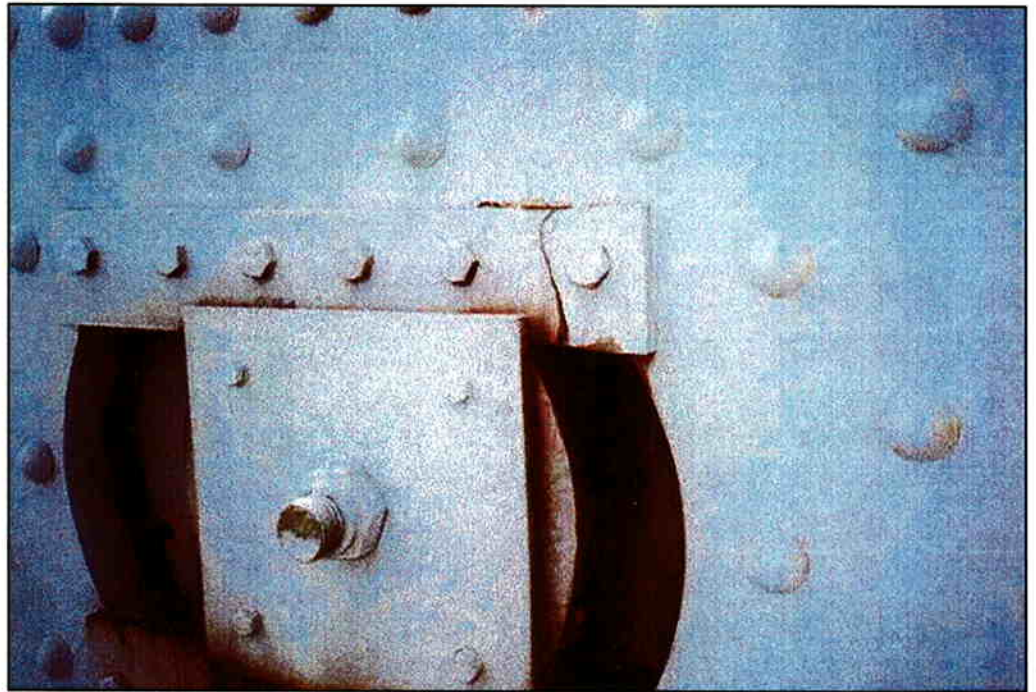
Looking at downstream face of downstream truss at U18. Note that guide bar for sliding pin connection is cracked.
